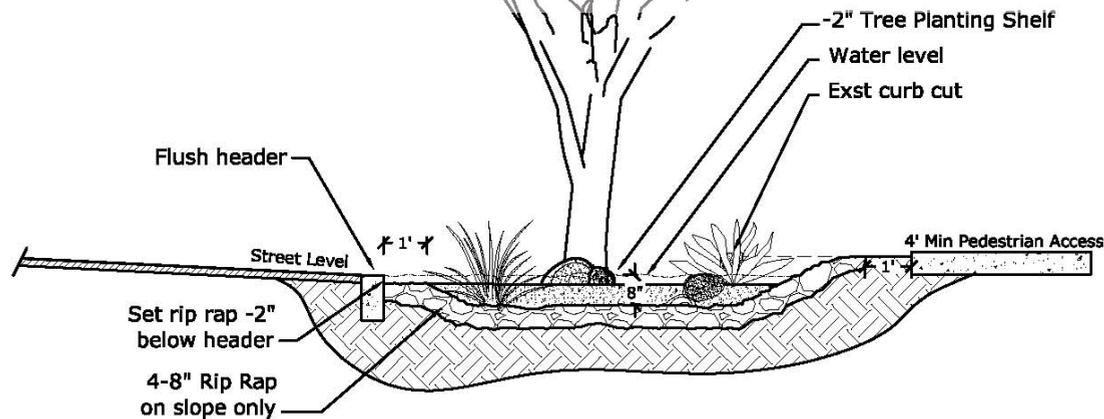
Typical cross-section of a chicane with flush curb and depressed bioretention area. For plan view, see Appendix.
